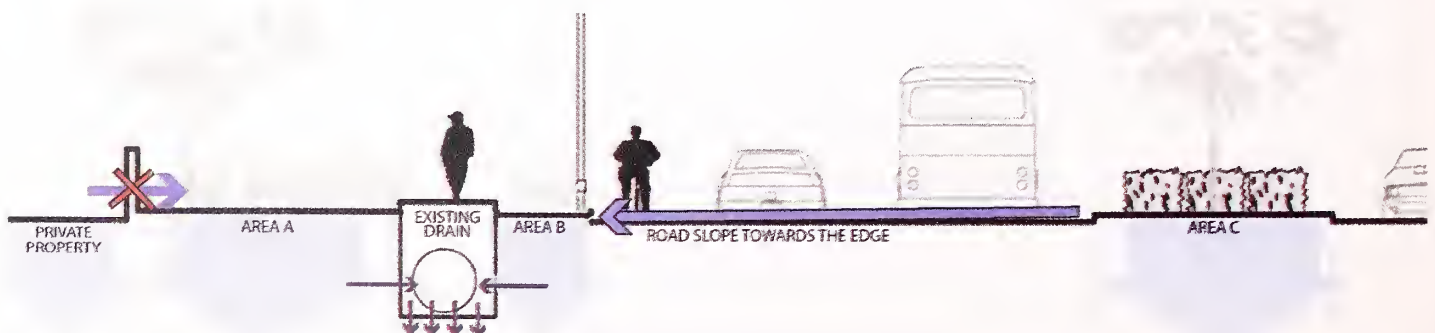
i (b) Cross-Section of Typical Road Side Detail Showing a Retro Fit Option for Storm Water Management Facilities
